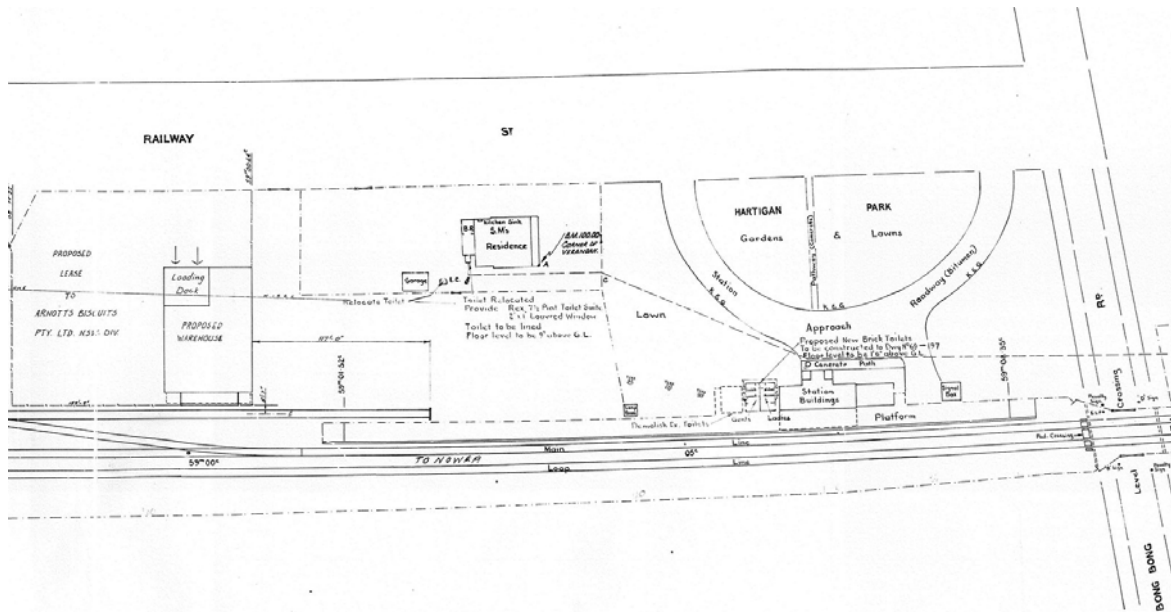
Schematic plan of Dapto Station, 1963, showing that the park was named Hartigan Park (Source: RailCorp Plan Room, 0445047)
